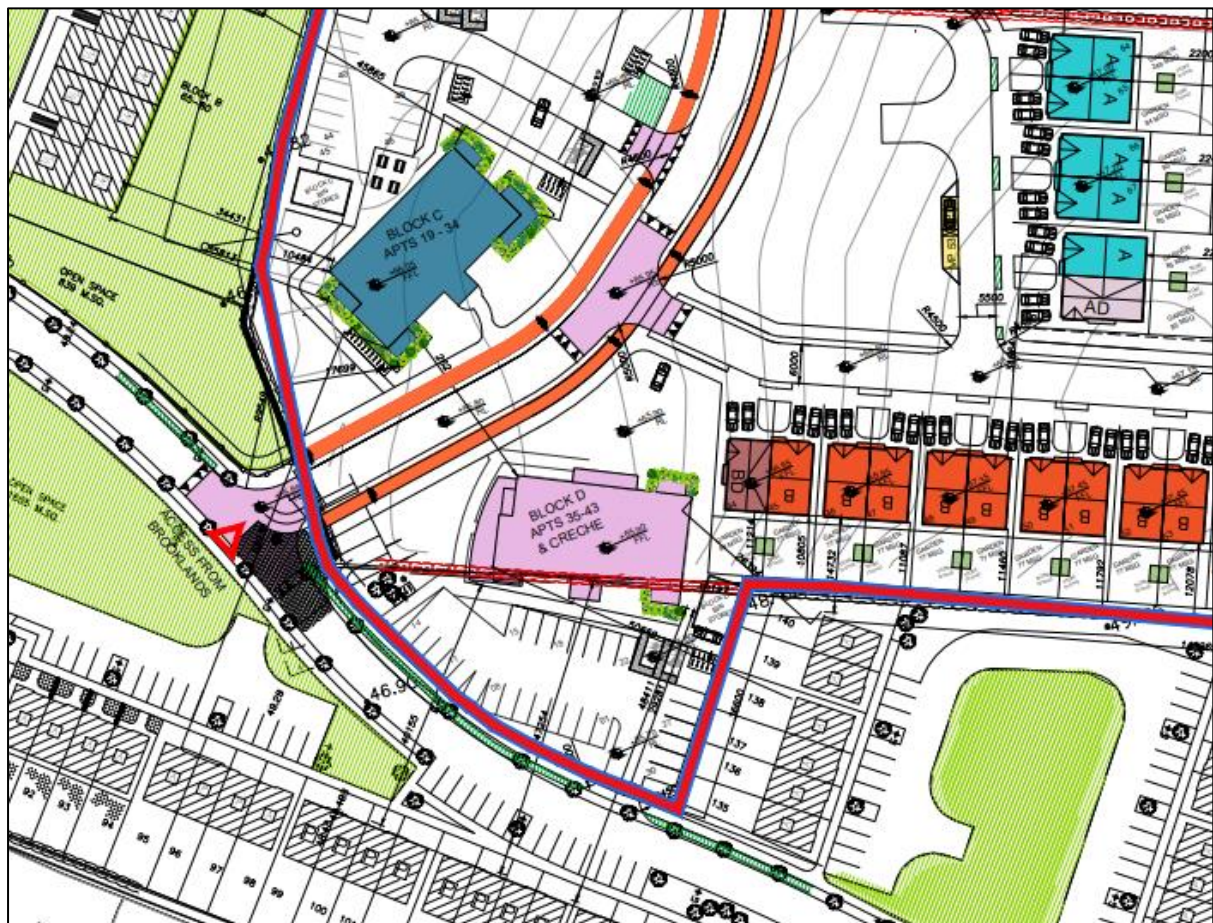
Excerpt from site layout plan showing location of the proposed creche
